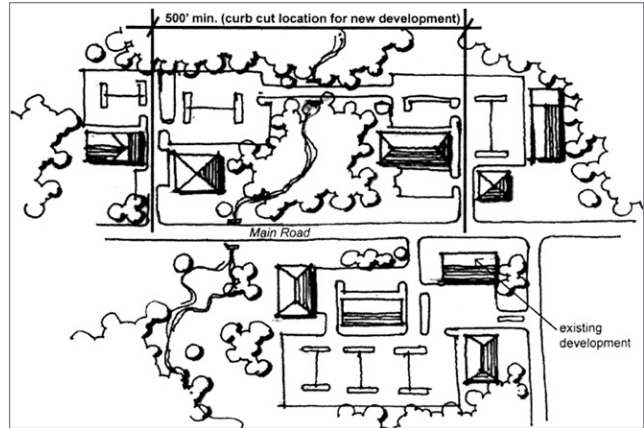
Plan illustrating benefits of limited and shared access include minimizing number of driveways for infill development.
